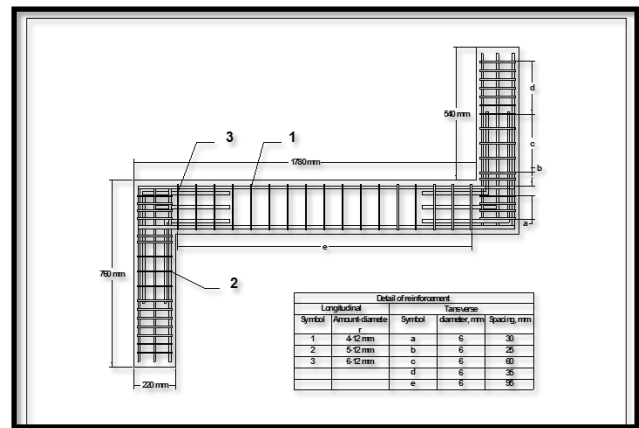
Detail of reinforcements in the fibrous concrete beam B-1-H
